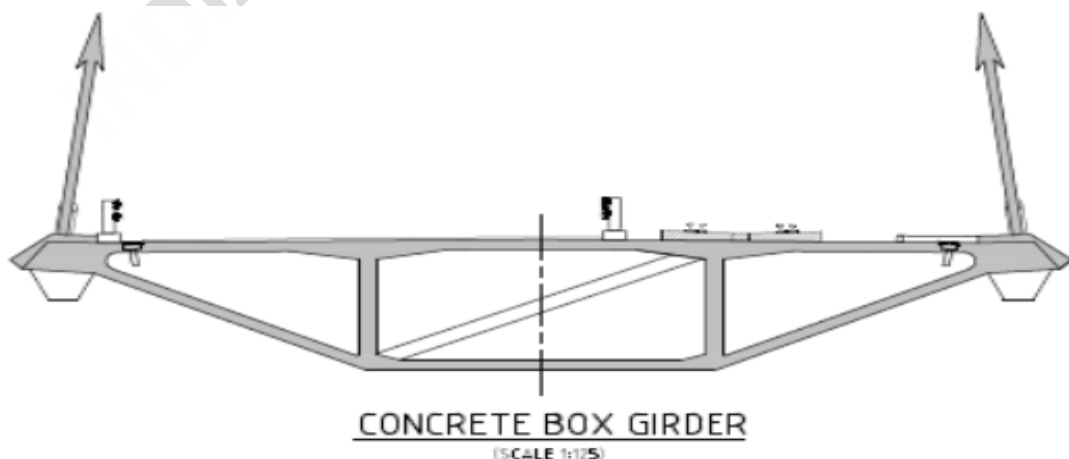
Typical Connection between Side deck cables and Box girder section
